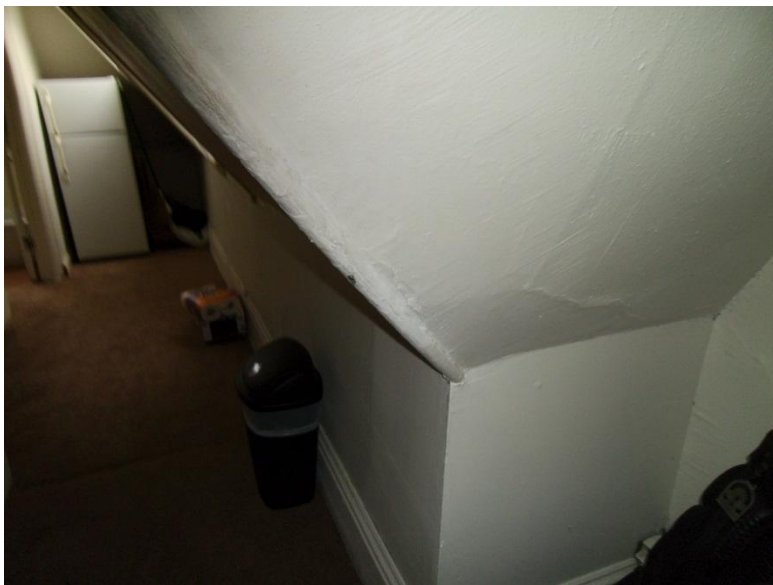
View showing a valley rafter bearing on the exterior wall. Note the deflection in the rafter and cracking in the plaster.
